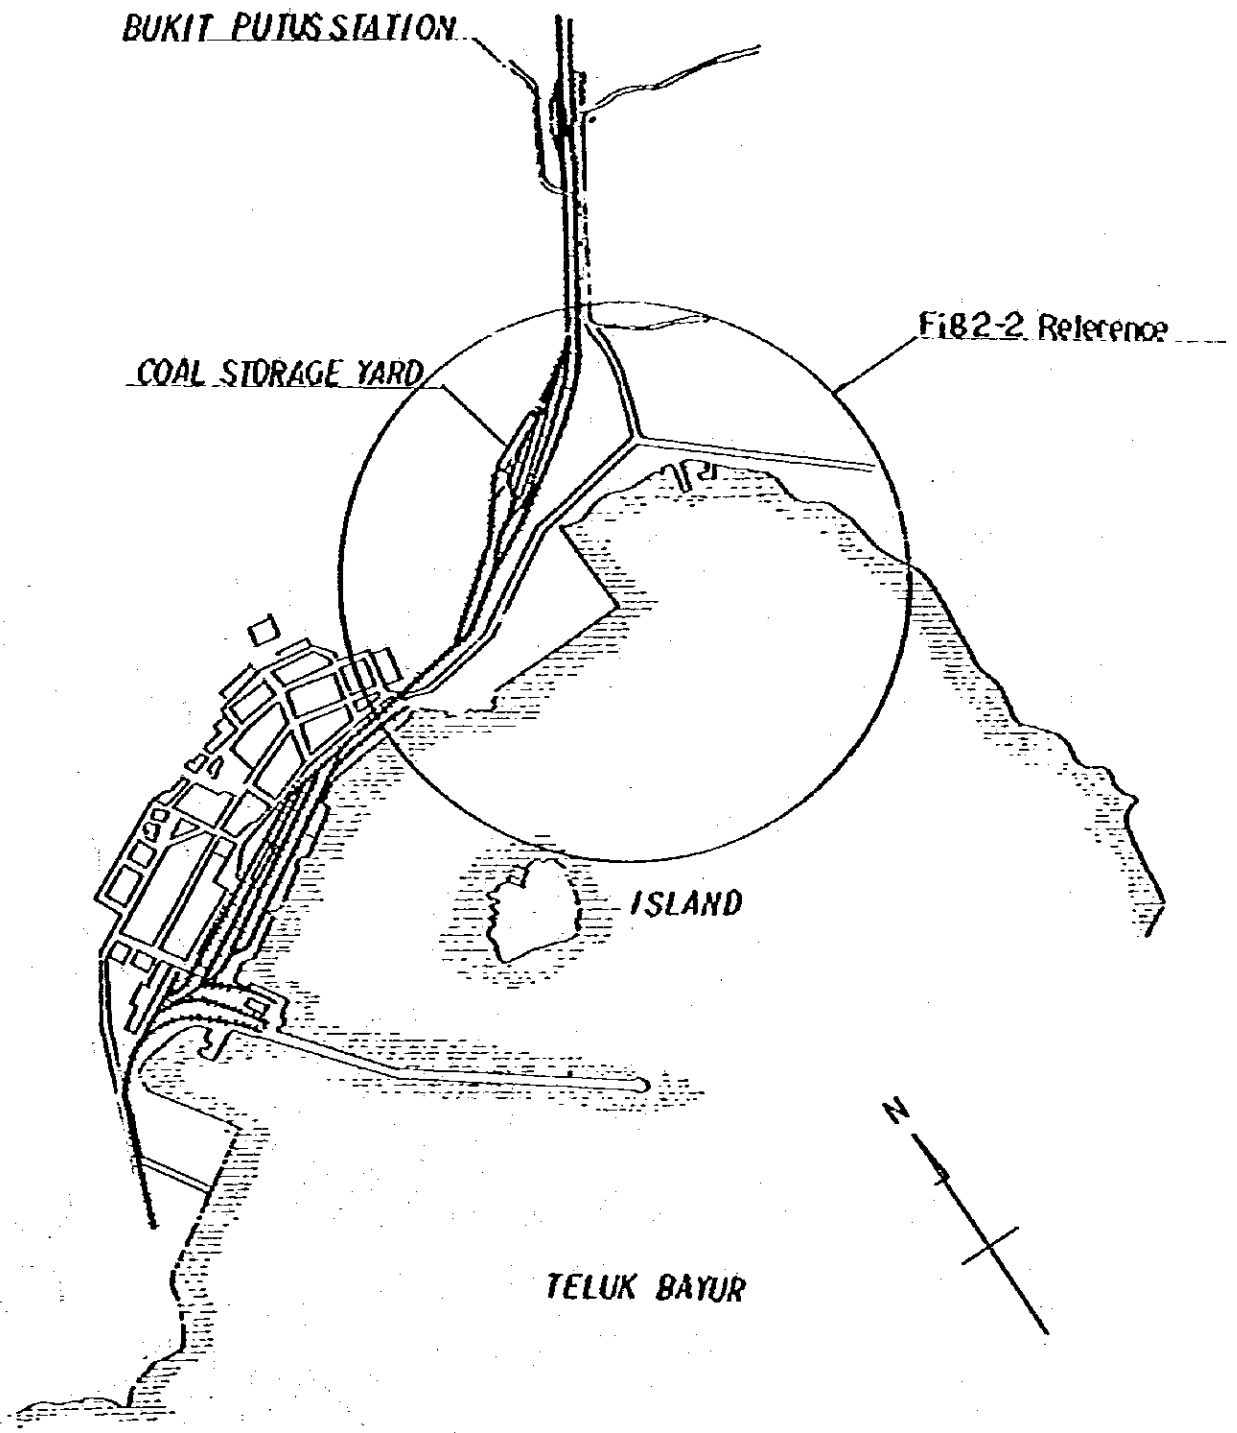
ARRANGEMENT OF THE FACILITIES
